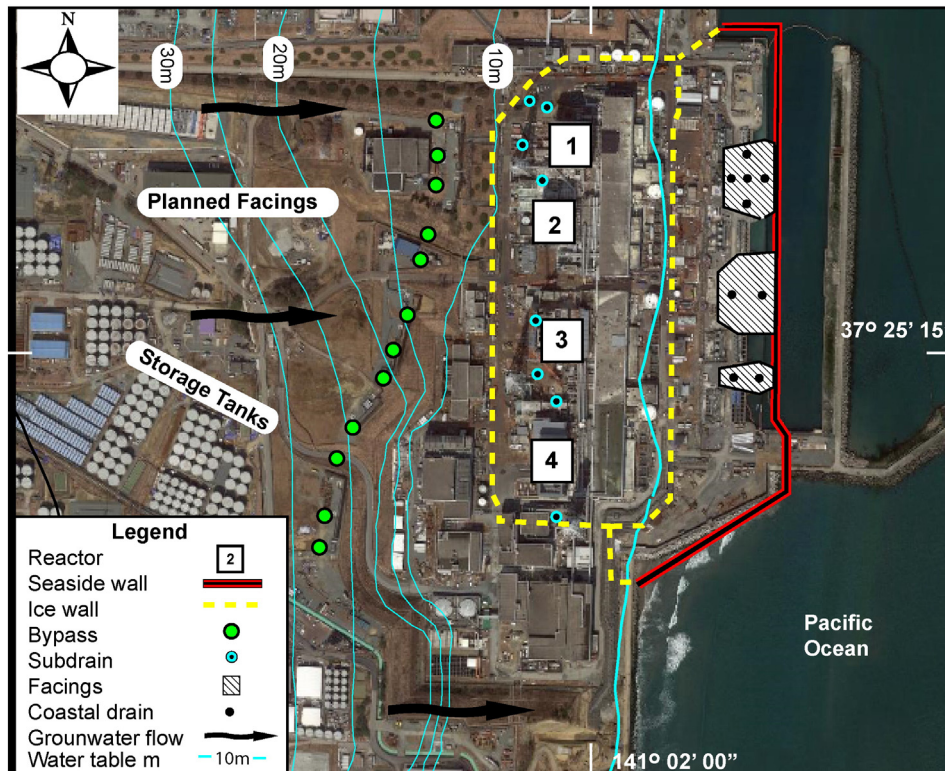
Plan view of storage facilities and engineering works to contain radioactively contaminated groundwater.
